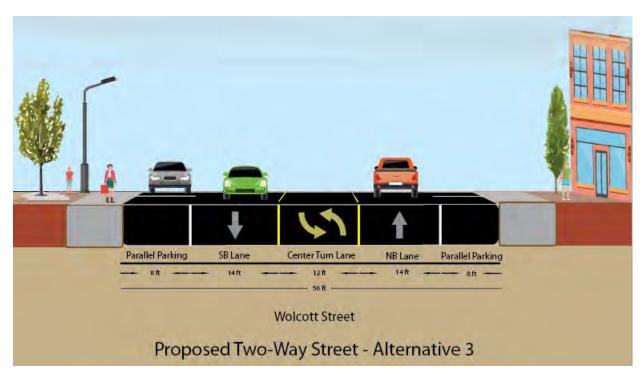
CONCEPTUAL TWO-WAY LANE CONFIGURATIONAL AND PAVEMENT MARKING
